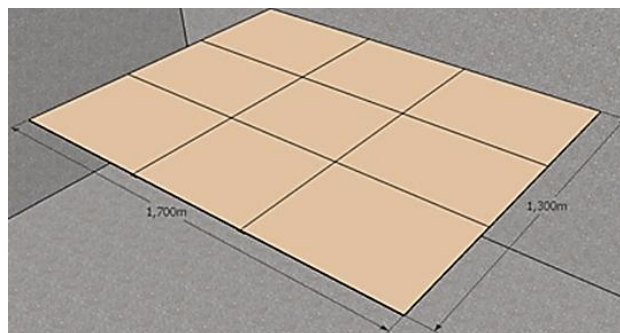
A 3-D sketch of a ceiling with dimensions
